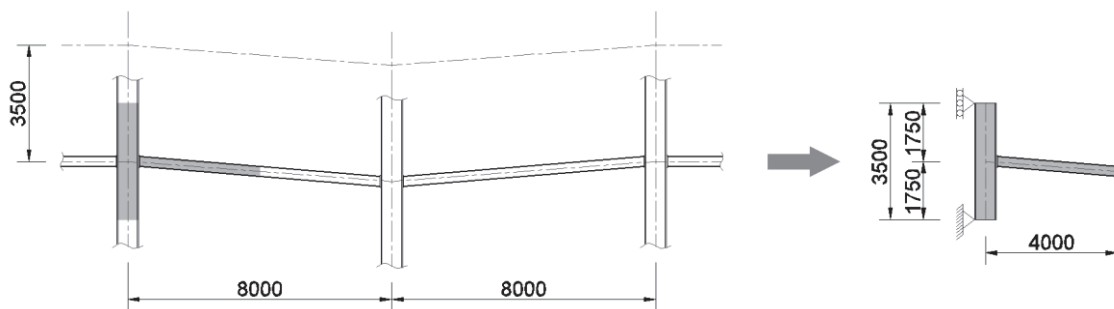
Substructure selection and beam-column joint model idealization - deformed shape under column loss action
